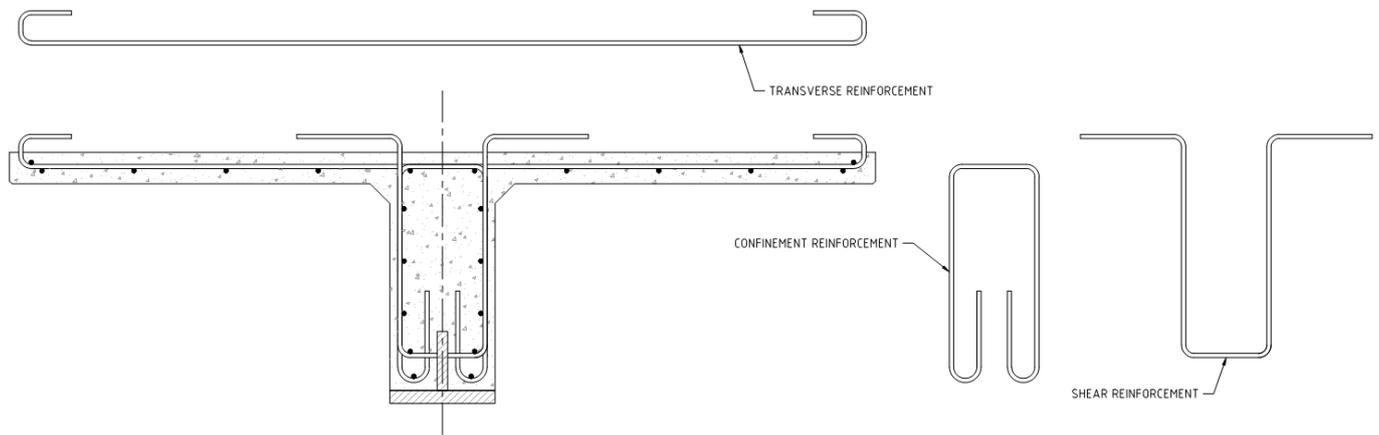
Typical reinforcement for a T-girder with a halved I-girder utilised as external reinforcement
